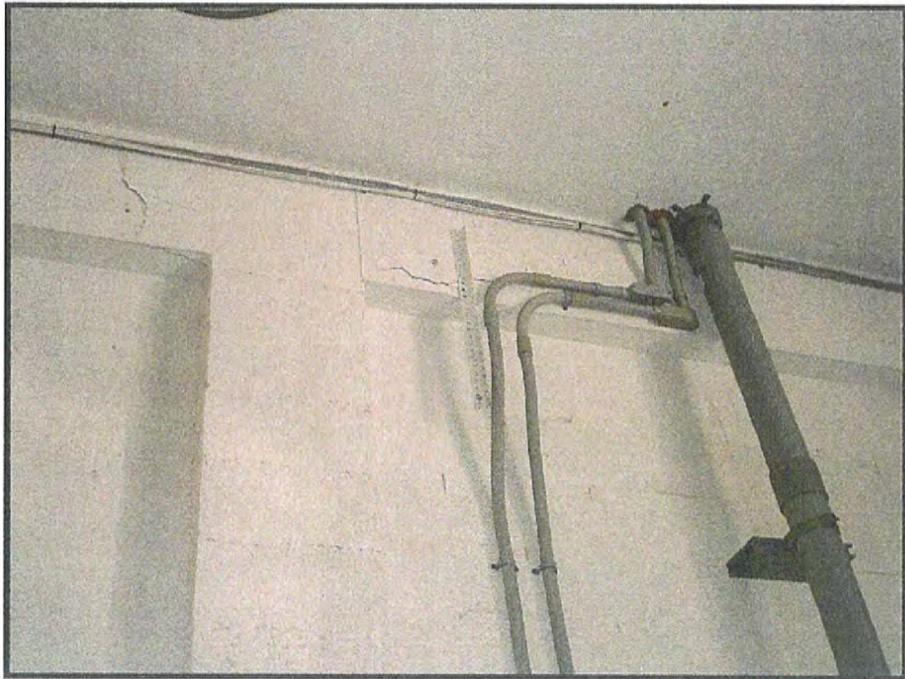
Horizontal crack outlining the delamination along the side face of 2nd level perimeter support beams. Condition is typical for beams within service areas.
